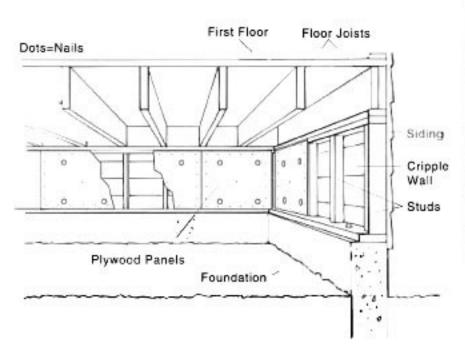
Plywood strengthens weak cripple walls. If your home has a cripple wall between the foundation and the first floor, and the wall is not braced with plywood sheathing, the house may collapse during an earthquake.
